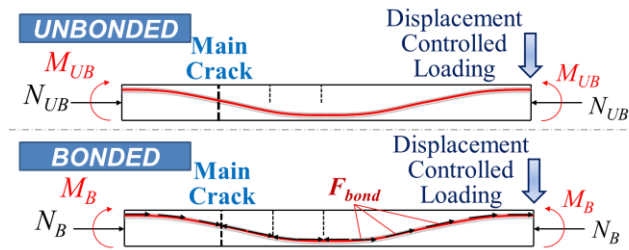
Limitation of crack development by prestressing: unbonded and bonded prestressing.
